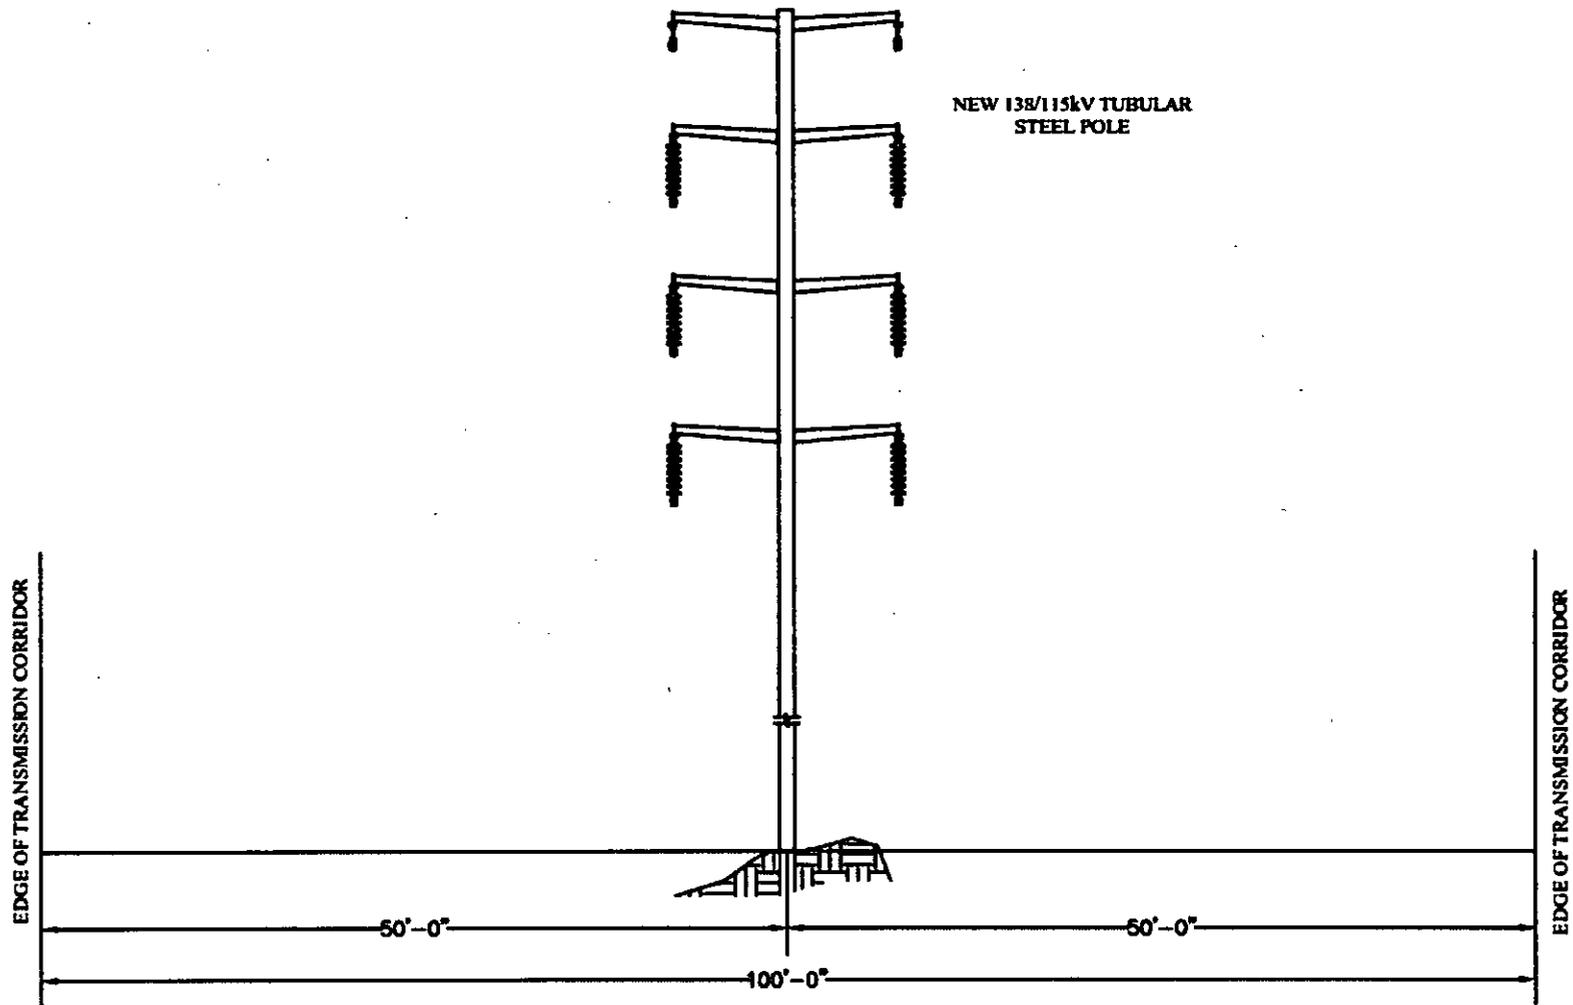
Typical Double-Circuit 115 kV Long Span Suspension Structure
